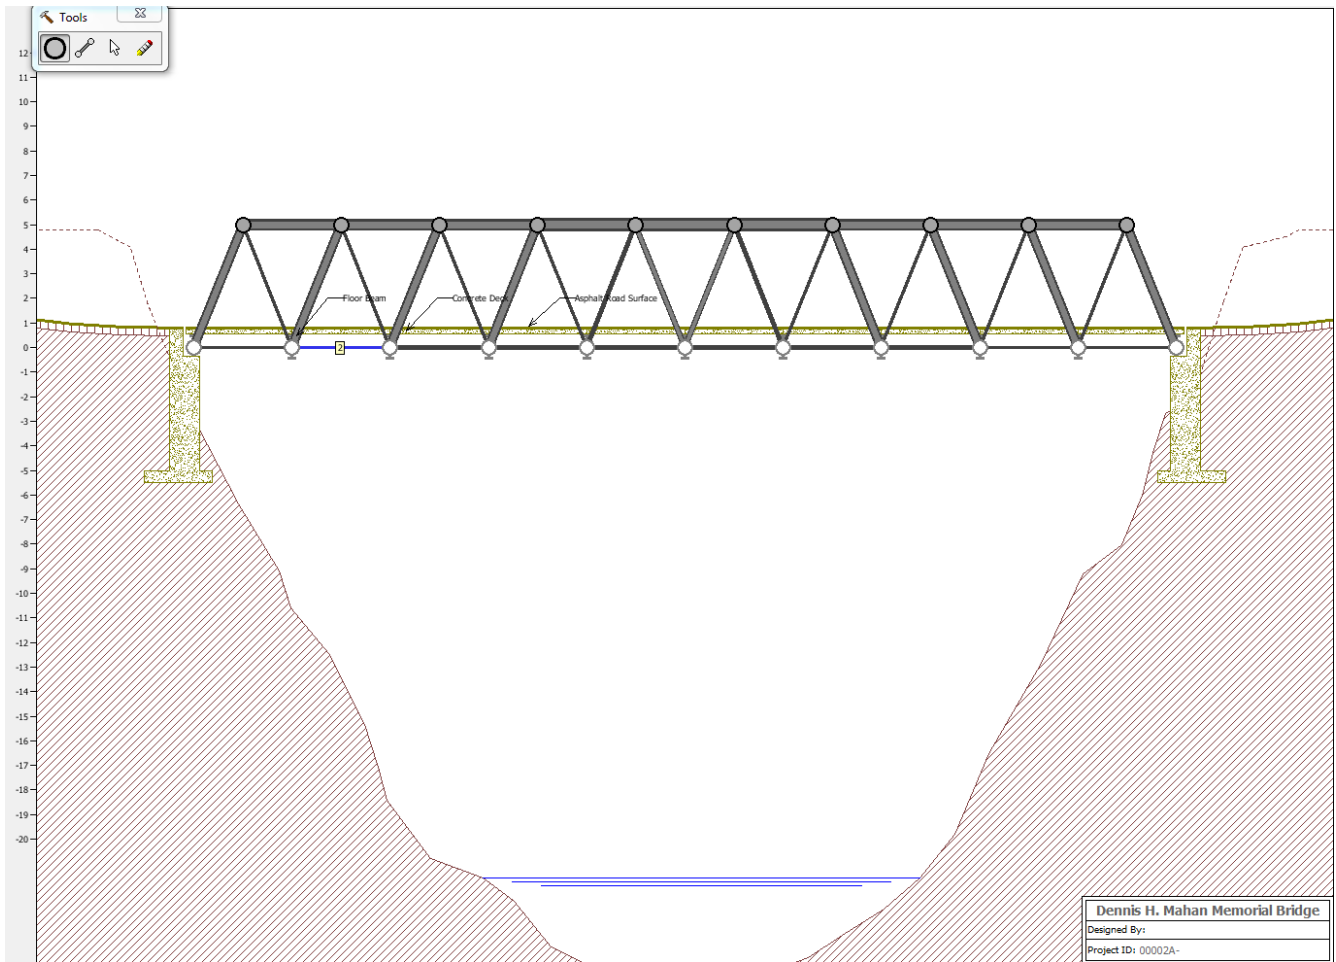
Warren Truss Bridge Model from Bridge Designer 2015
